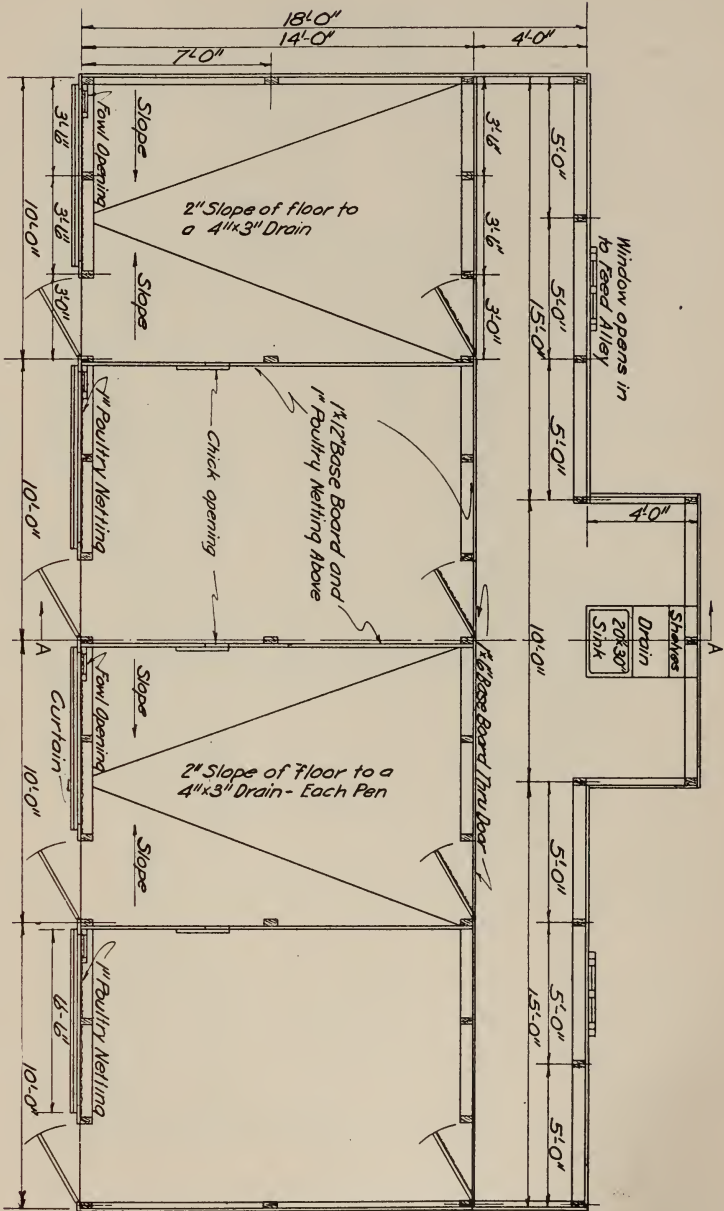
Floor plan of brooder house showing four pens 10 X 14 feet, the alleyway at the rear of pens, and an extension in which is located a sink for washing utensils and storage space for chick feed and litter.
